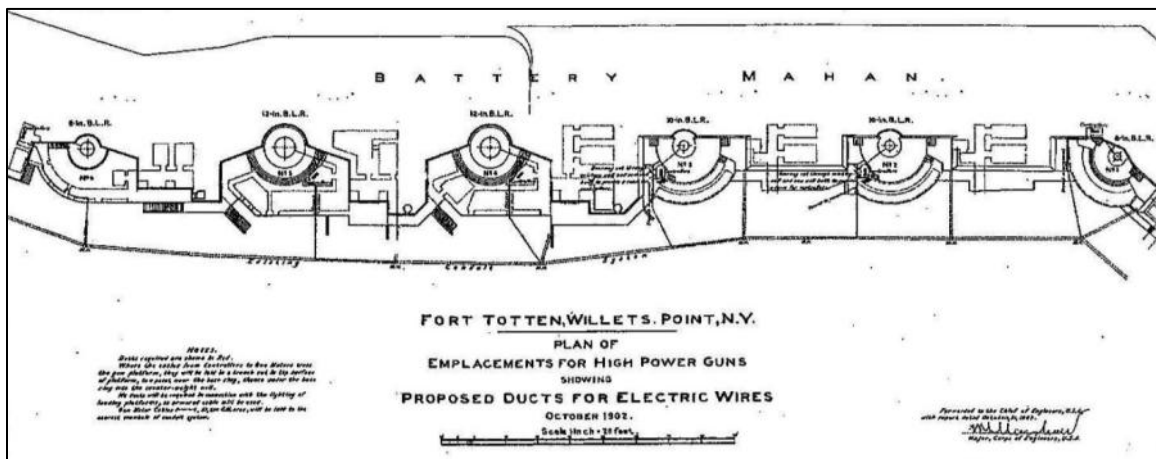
Details of 'Fort Totten, Willets Point, N.Y. Plan of Emplacements for High Power Guns Showing Proposed Ducts for Electric Wires. October 1902' Showing the Upper Endicotts before the southern extensions were built (NARA, RG 77, Drawer 35, Sheet 60a12)
